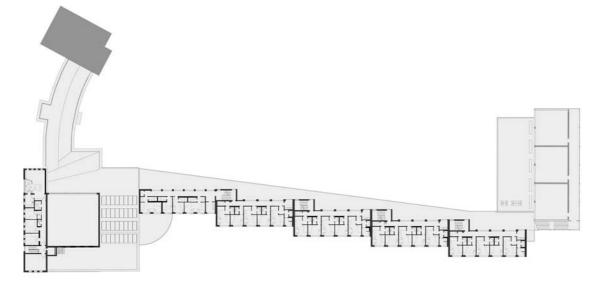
Groundplan, upper floor of the school building in current condition 2015, plan 2015, Brenne Architekten
